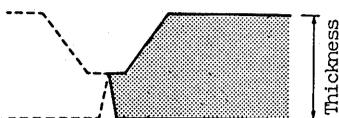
Configuration of side surface of prestressed concrete panel
